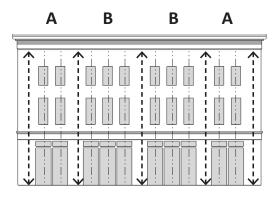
C.2: Structural and fenestration centerlines, showing how the solid and voids in the FAÇADE align vertically; and organization of the FAÇADE into vertical modules. The FAÇADE example here follows an ABBA pattern.
